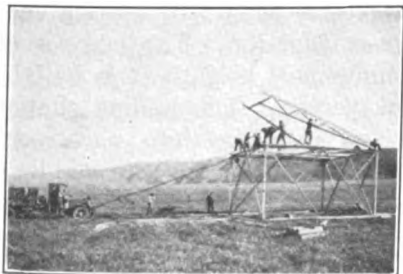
ERECTING TOWER ON TOP OF 14-FT. EXTENSION
